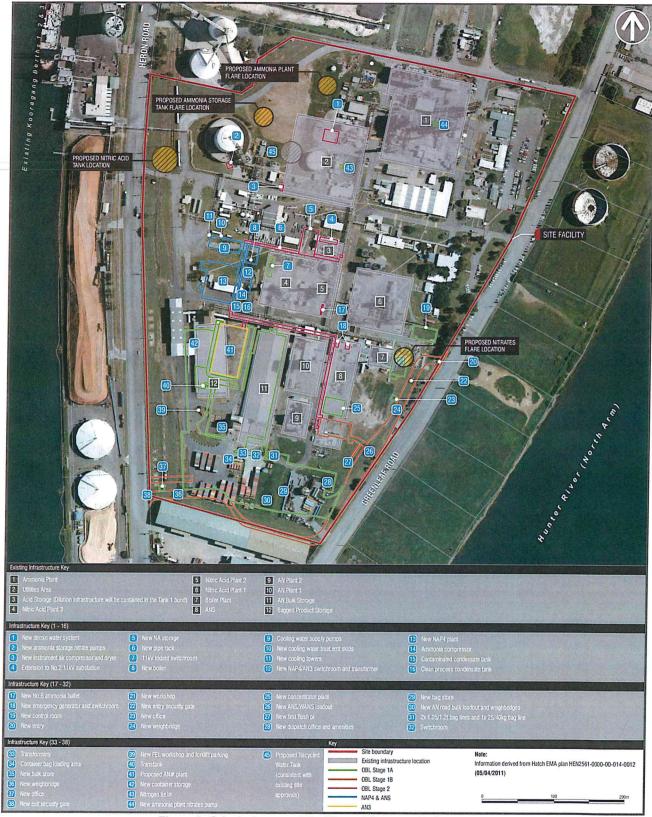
Orica's Approved Facility and Proposed Infrastructure
